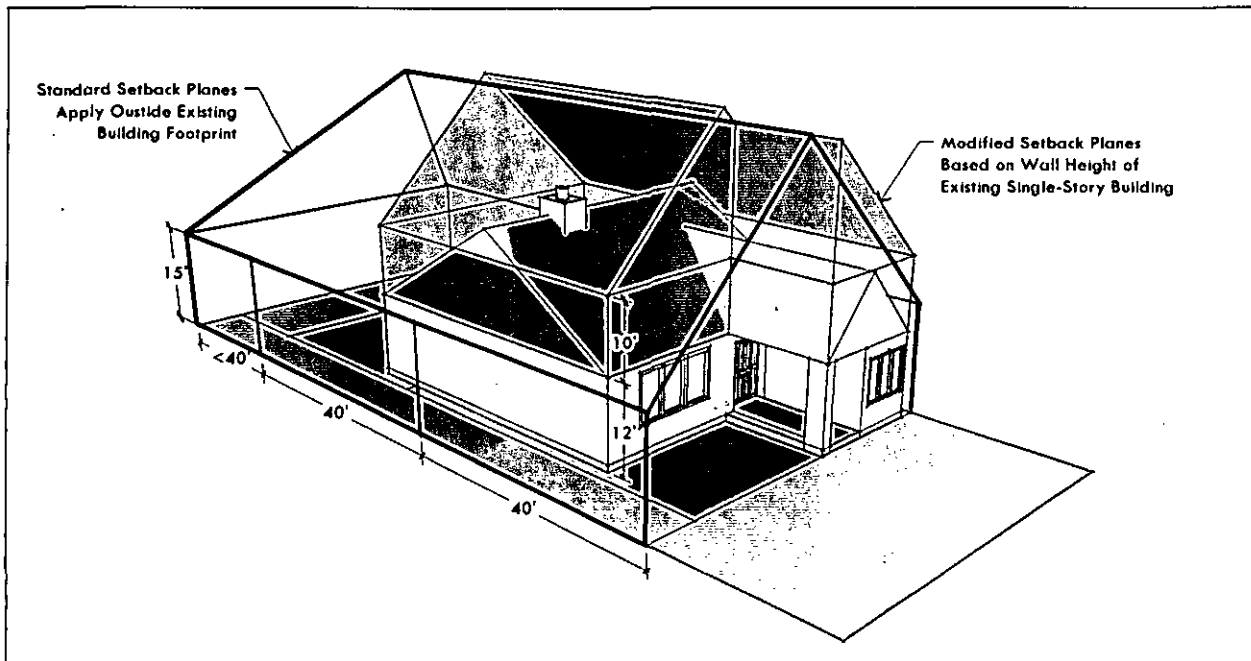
Side Setback Plane Exception for Existing Single-Story Buildings
